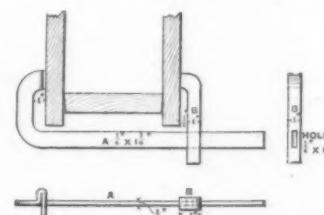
CLAMP FOR BEAM OF SMALL COLUMN FORM.
